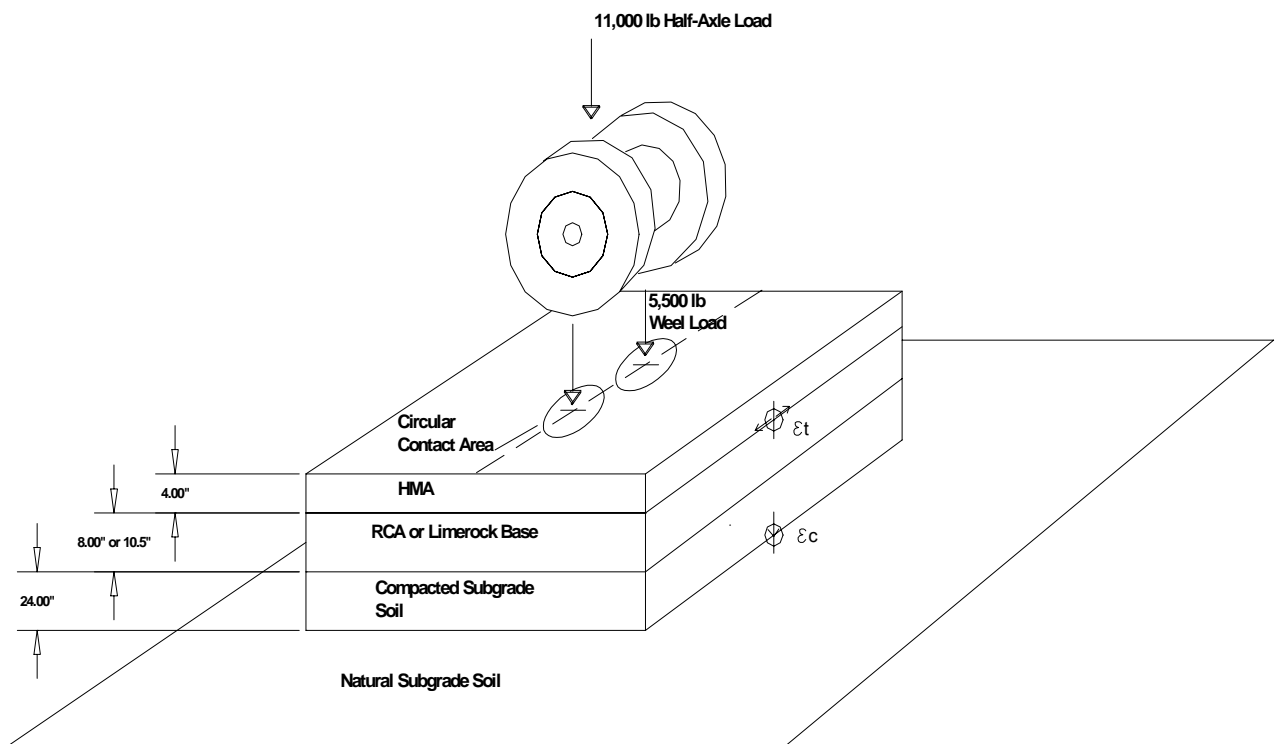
Wheel Load and Pavement Cross Section for Kenlayer Input
